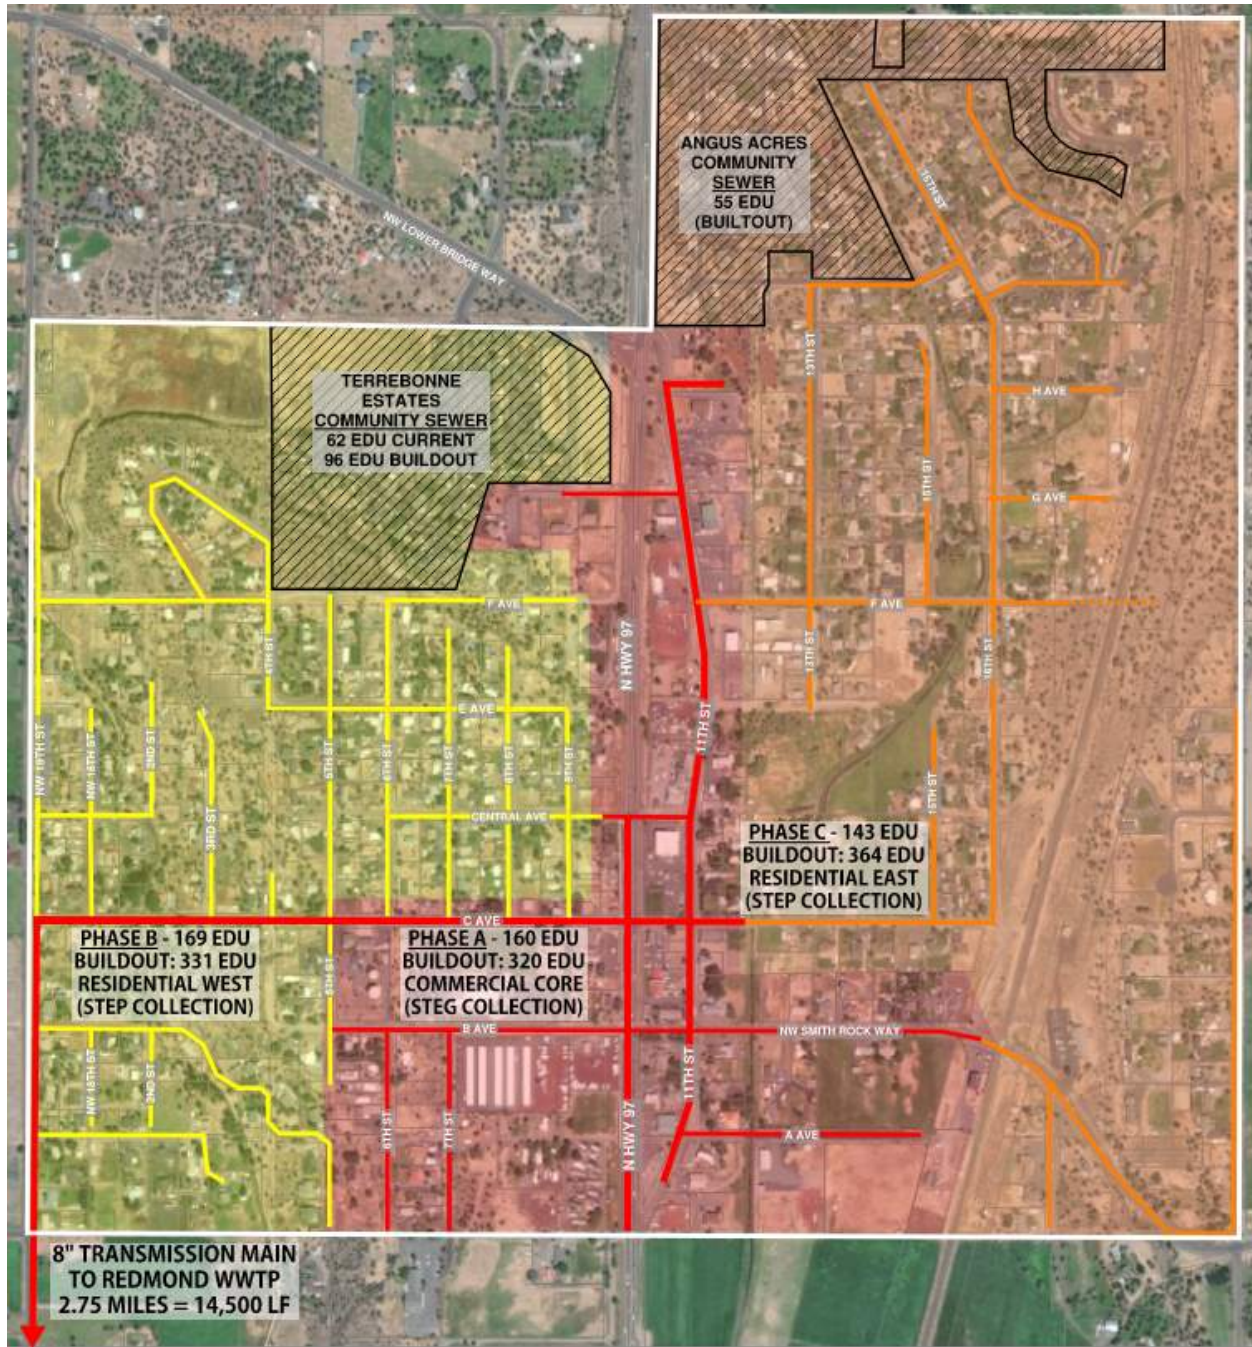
Schematic Layout of Alternative 3 – STEP Collection to Redmond Wetlands Complex
